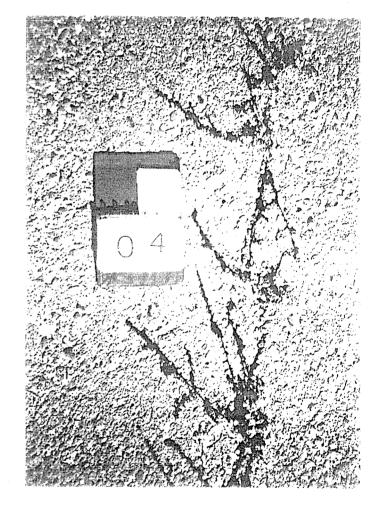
Crack of Photo 3.9 After Sandblasting
